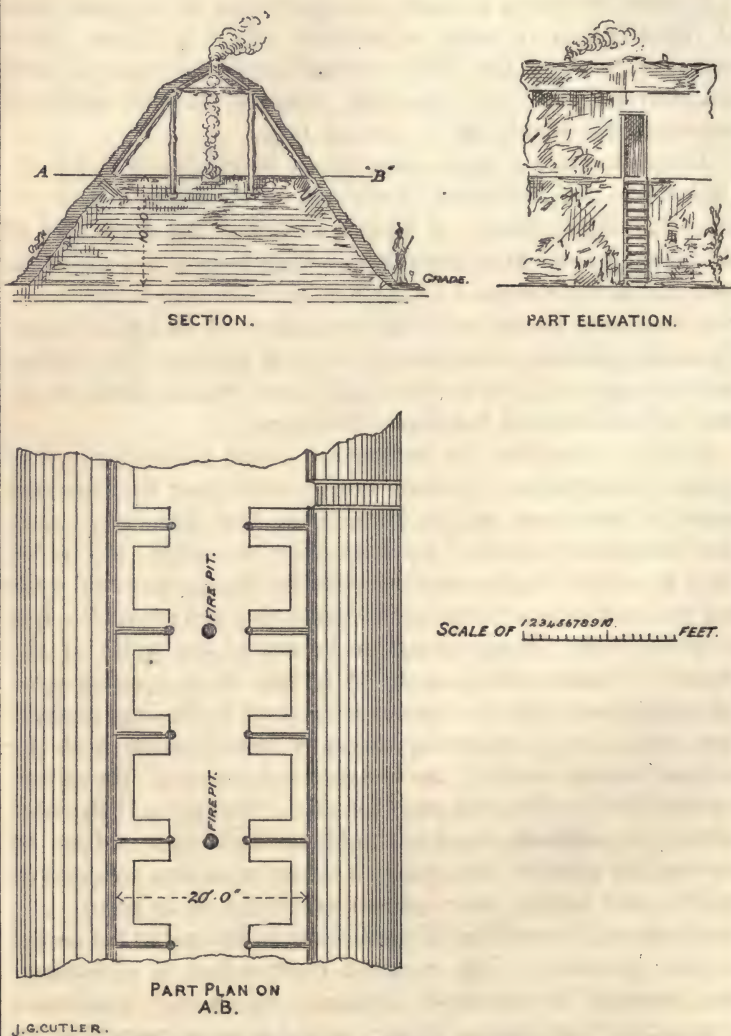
GROUND PLAN AND SECTIONS OF HOUSE.
